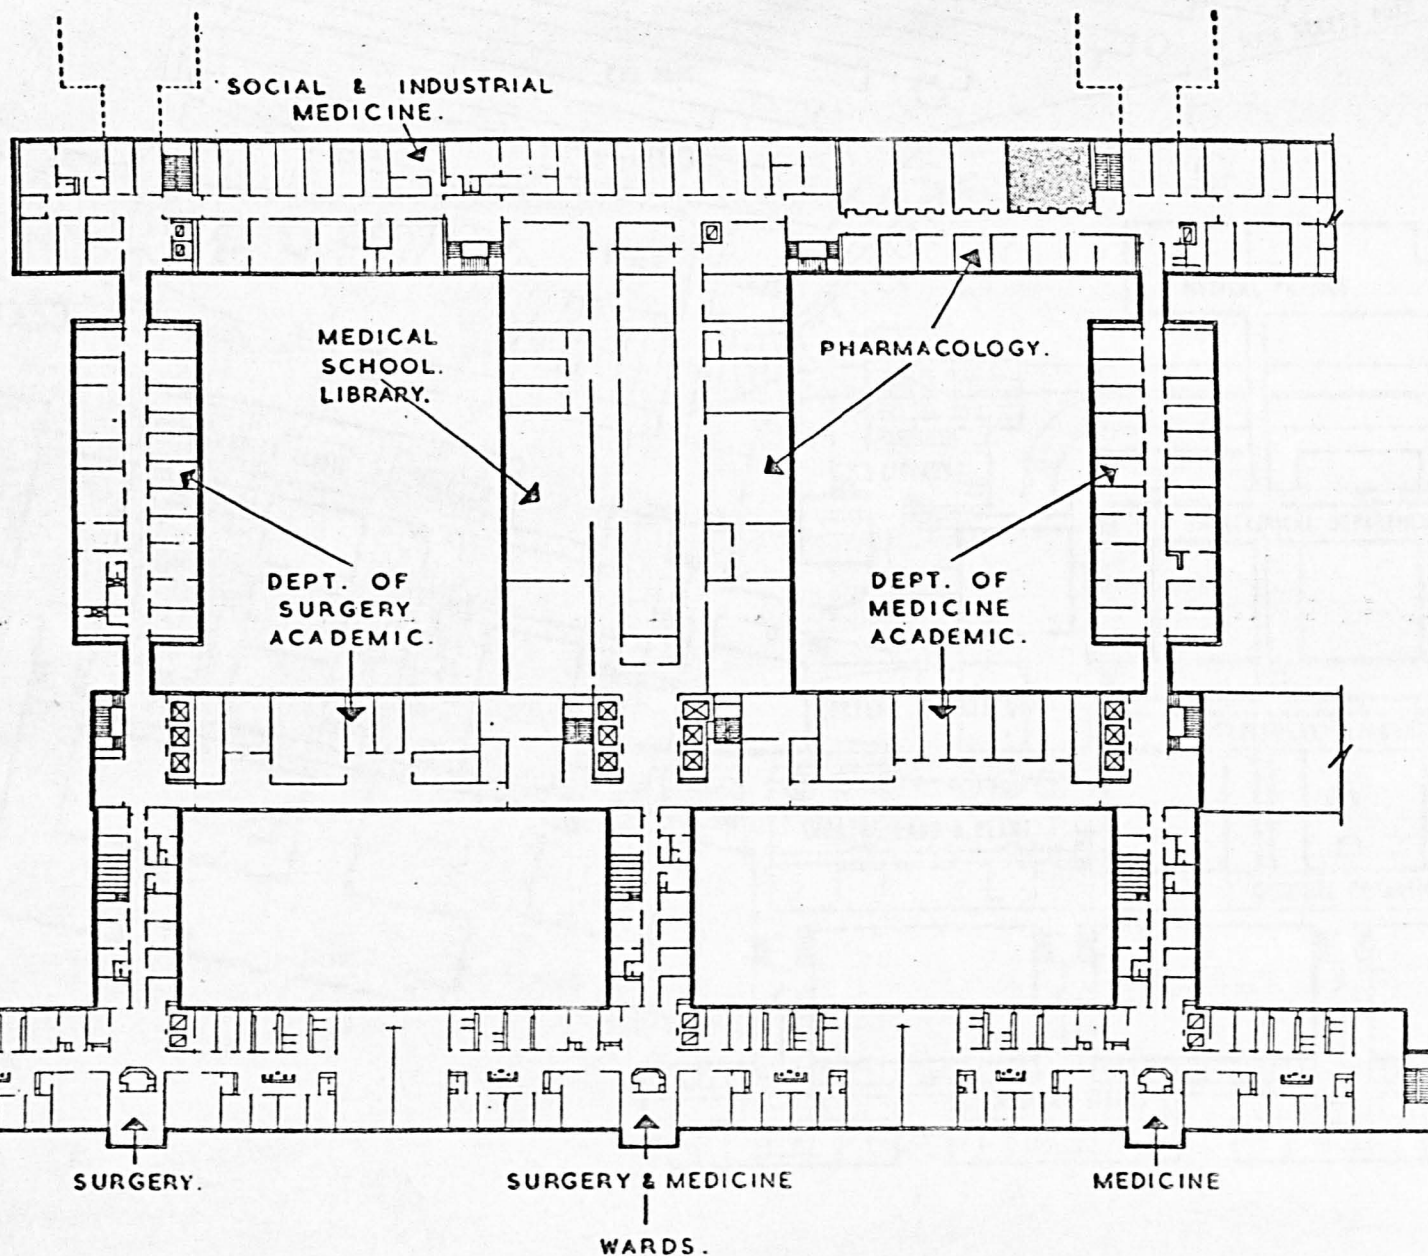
WELSH NATIONAL SCHOOL OF MEDICINE: Upper ground floor plan.
